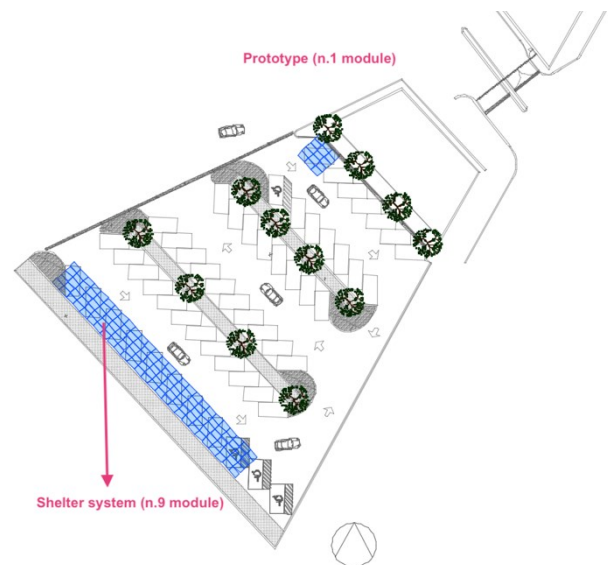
Layout of the parking area with the prototype and the whole shelter system.
